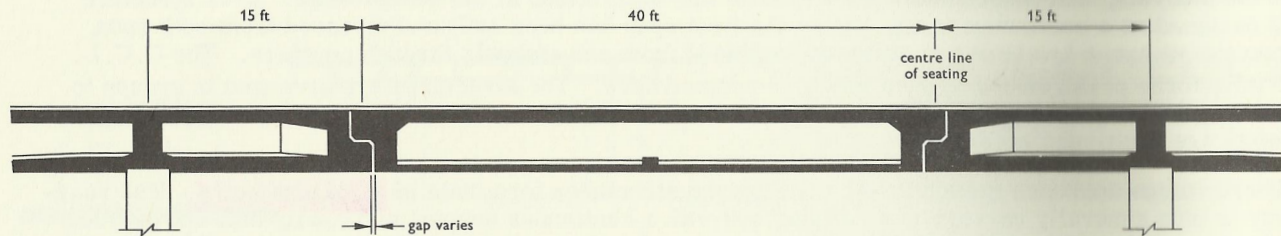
Typical longitudinal section, approach road cantilever and suspended span construction.
